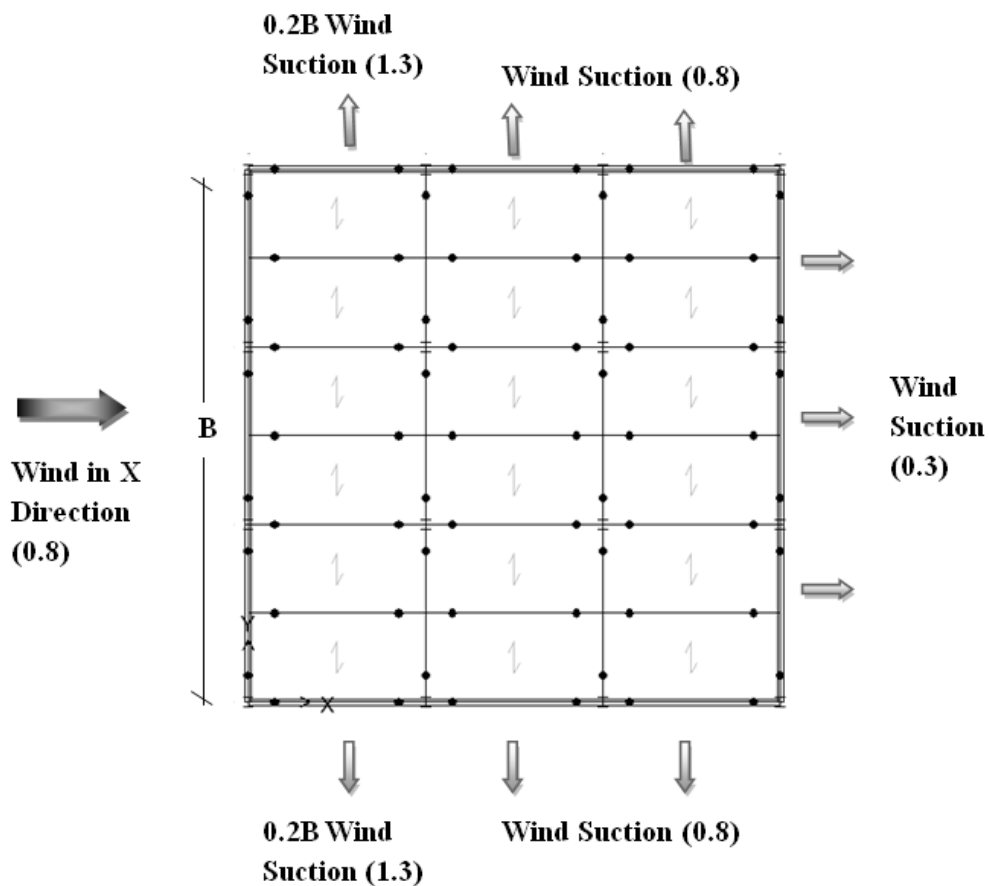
(a): Building plan layout indicating simple frame with pinned connections with wind in X direction with suctions for symmetrical plan and section [14].
